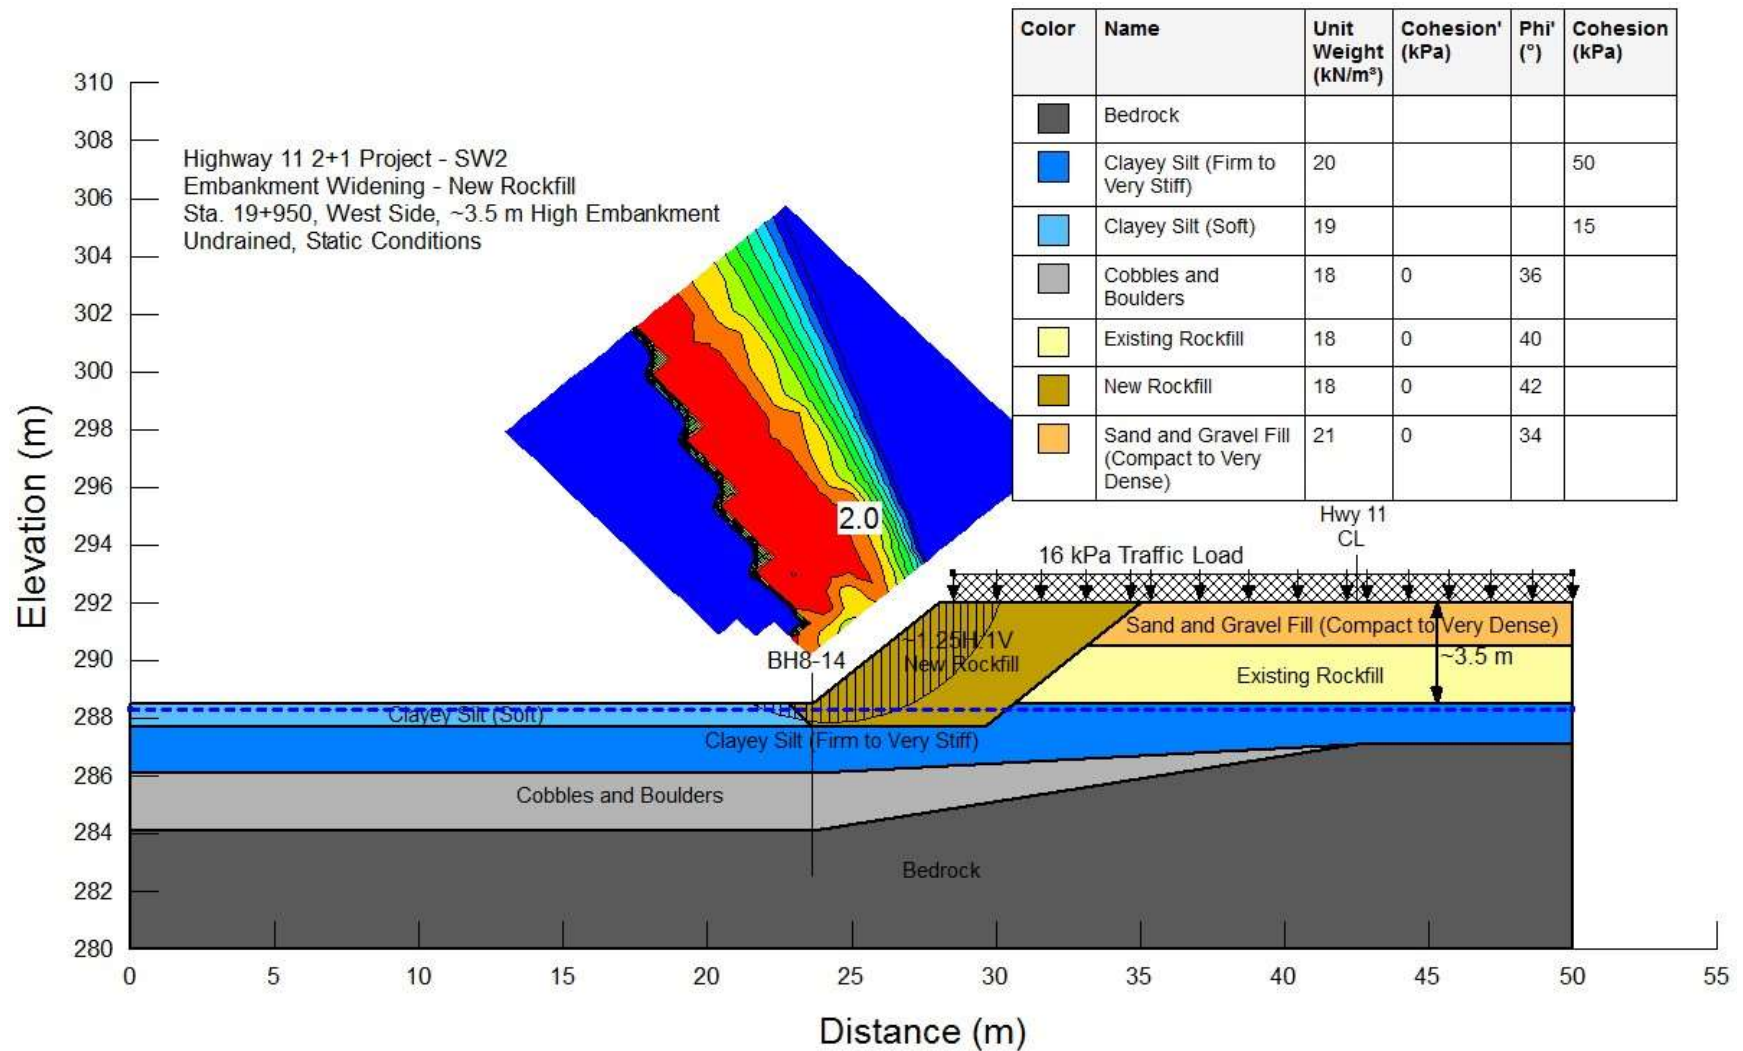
Slope stability analysis for embankment widening at Sta. 19+950, west side (~3.5 m high) – Rockfill (1.25H:1V) – undrained, static condition
